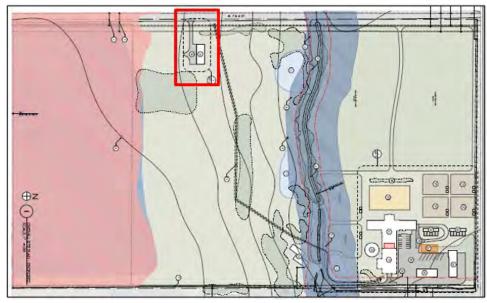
Proposed site plan, with heavy equipment storage building indicated in red. NOTE: North is to the right on the image.
